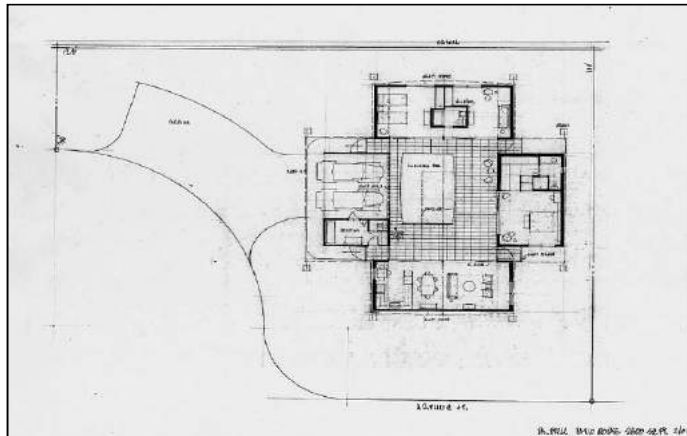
Brill House [Charles Reed, Jr. collection, c. 1959]
